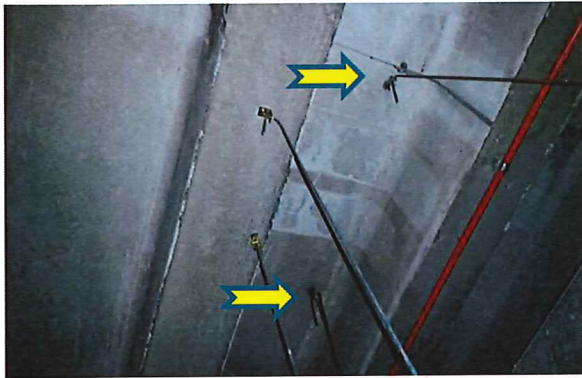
Example of an asbestos cement lined coffer that has had suspended ceiling hangers fixed direct into the asbestos material (i.e. potential for loose debris).
